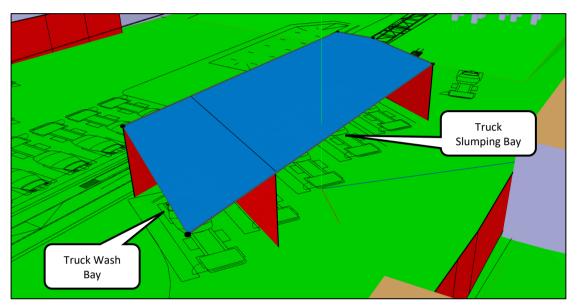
3D IMAGE OF SLUMP STAND AREA
